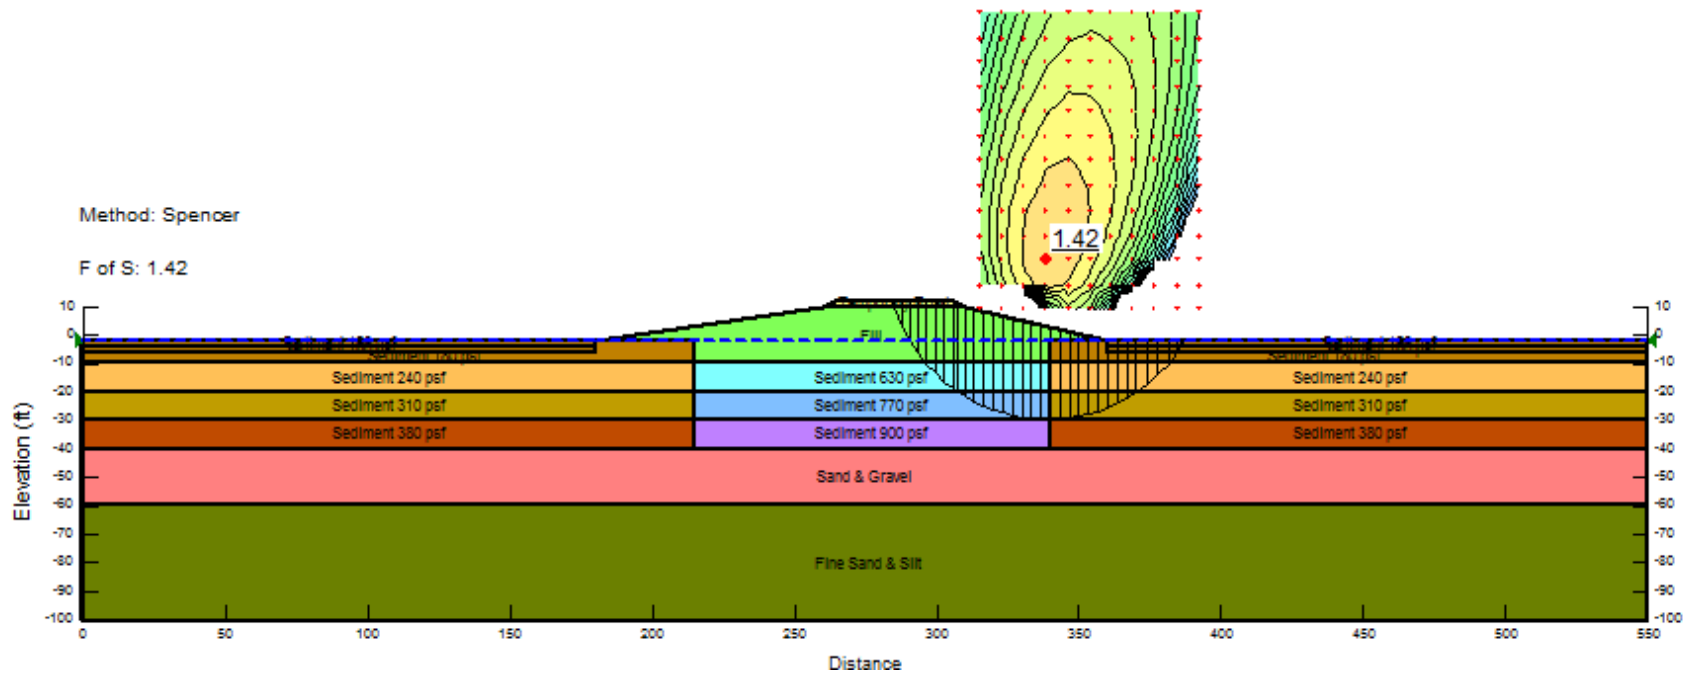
Causeway with 2-foot Thick Construction Access Road
